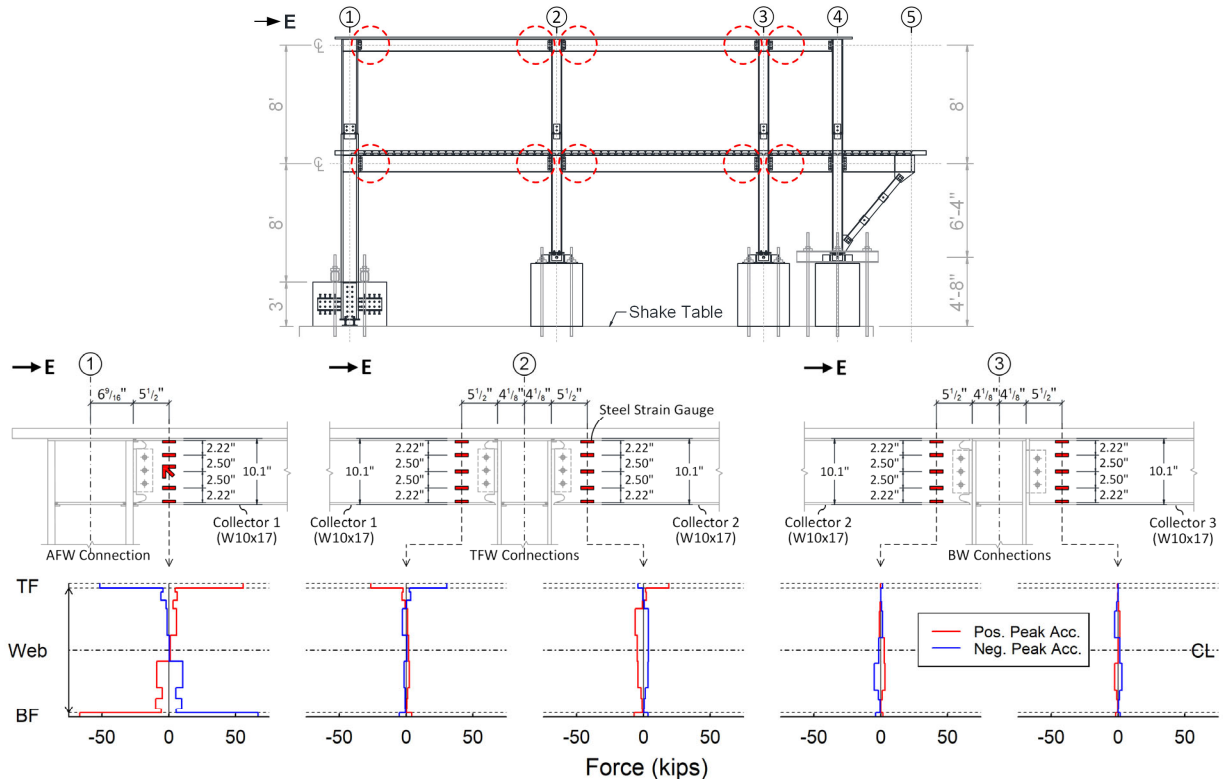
Test 2B-5: Fiber Axial Force Profiles of Roof Collector Connections
